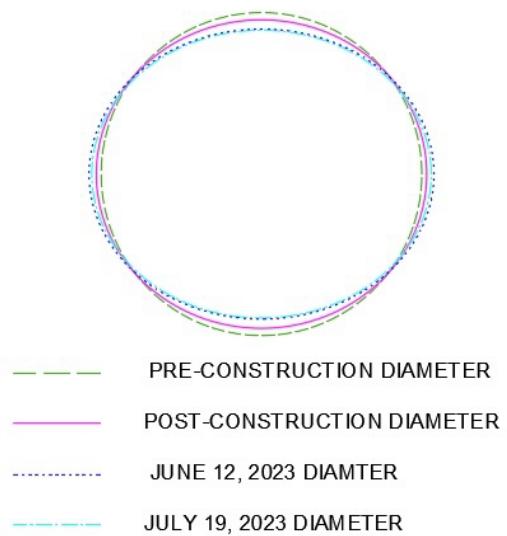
Illustration of culvert deflection from prior to construction to July 19, 2023
